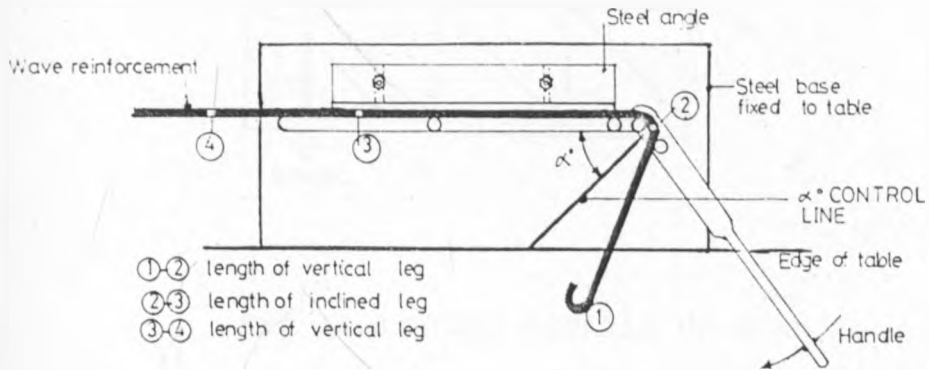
PLAN SHOWING A TYPICAL BAR BENDING ARRANGEMENT
